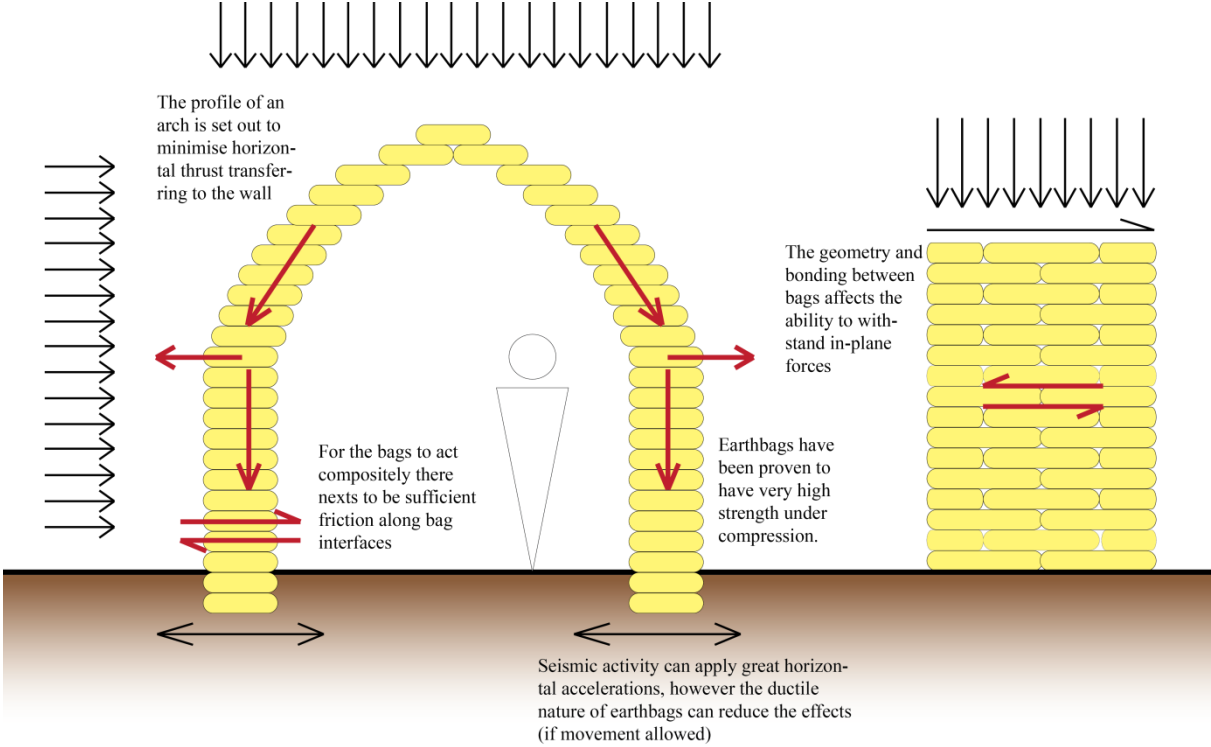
Earthbag dome section (left) and earthbag wall under shear (right)
